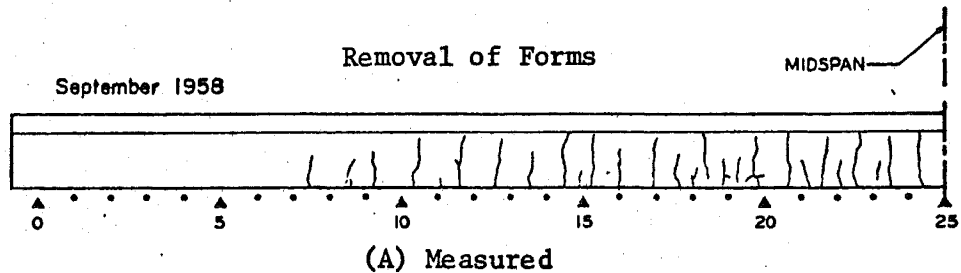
Example No. 2 (Bridge 8B): Crack Patterns in the Exterior Beam
